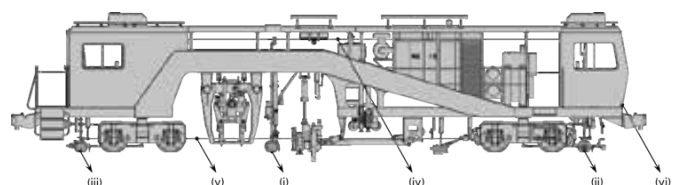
Location of measuring system components (O8-16 SH universal tamping machine illustrated).
